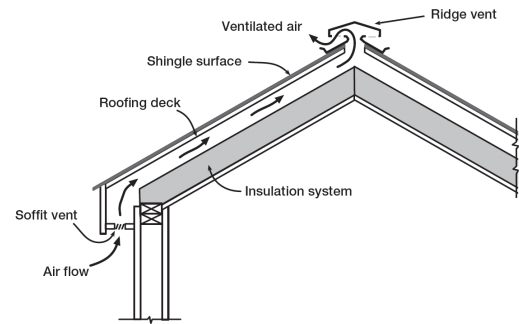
Figure A: Ridge and soffit ventilation system for cathedral ceilings using insulation vent baffles
